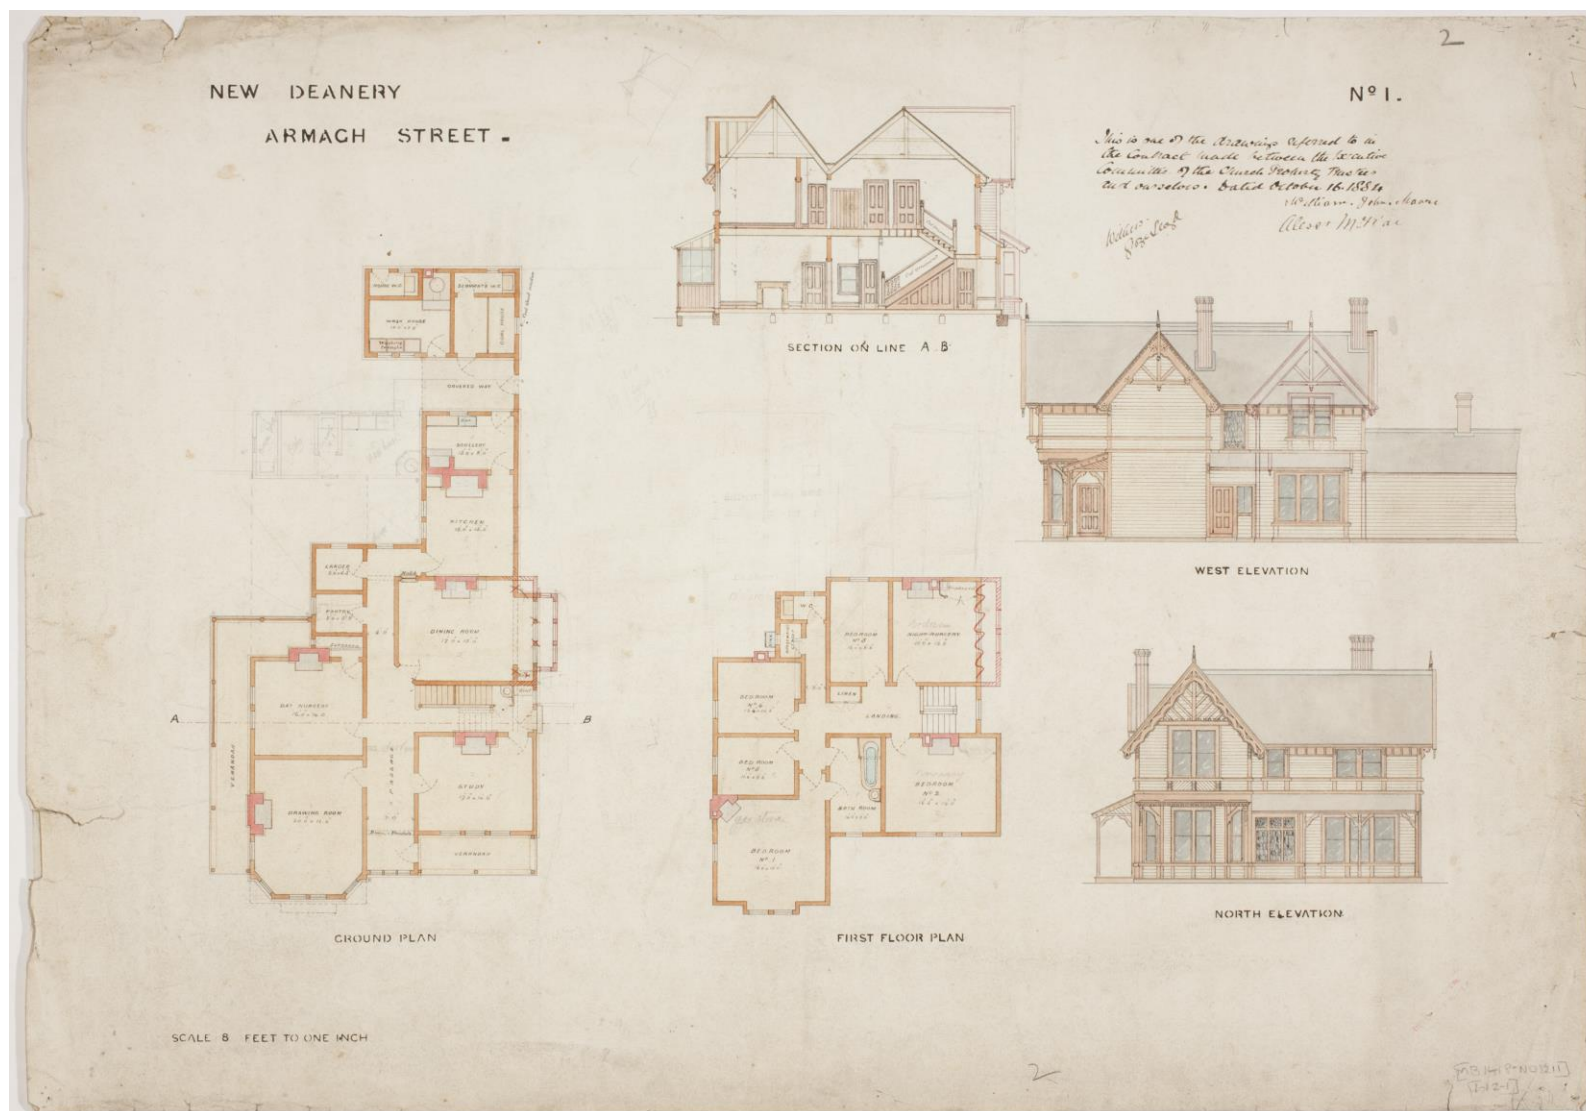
Armson, Collins and Lloyd, New Deanery, Armagh Street, plans, elevations and sections (1884).
